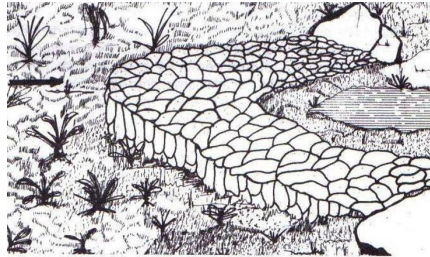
Construction of successive barriers Source: Paraiba (1994)
